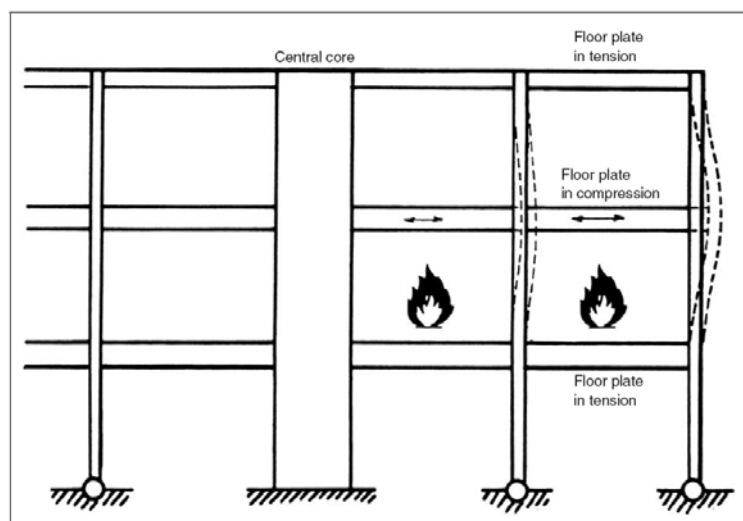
Elevation showing blocking effect of the edge construction (Van Acker, 2003)
